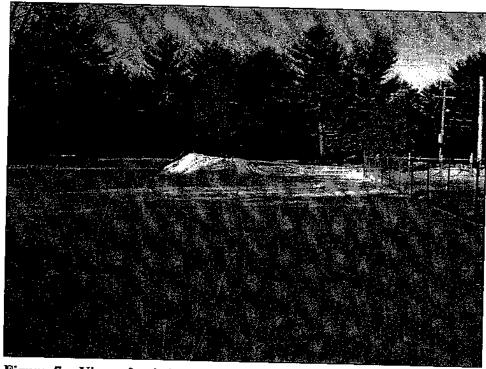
View of existing Laconia Meter Station fencing (right) and proposed additional temporary workspace, view facing southwest.
